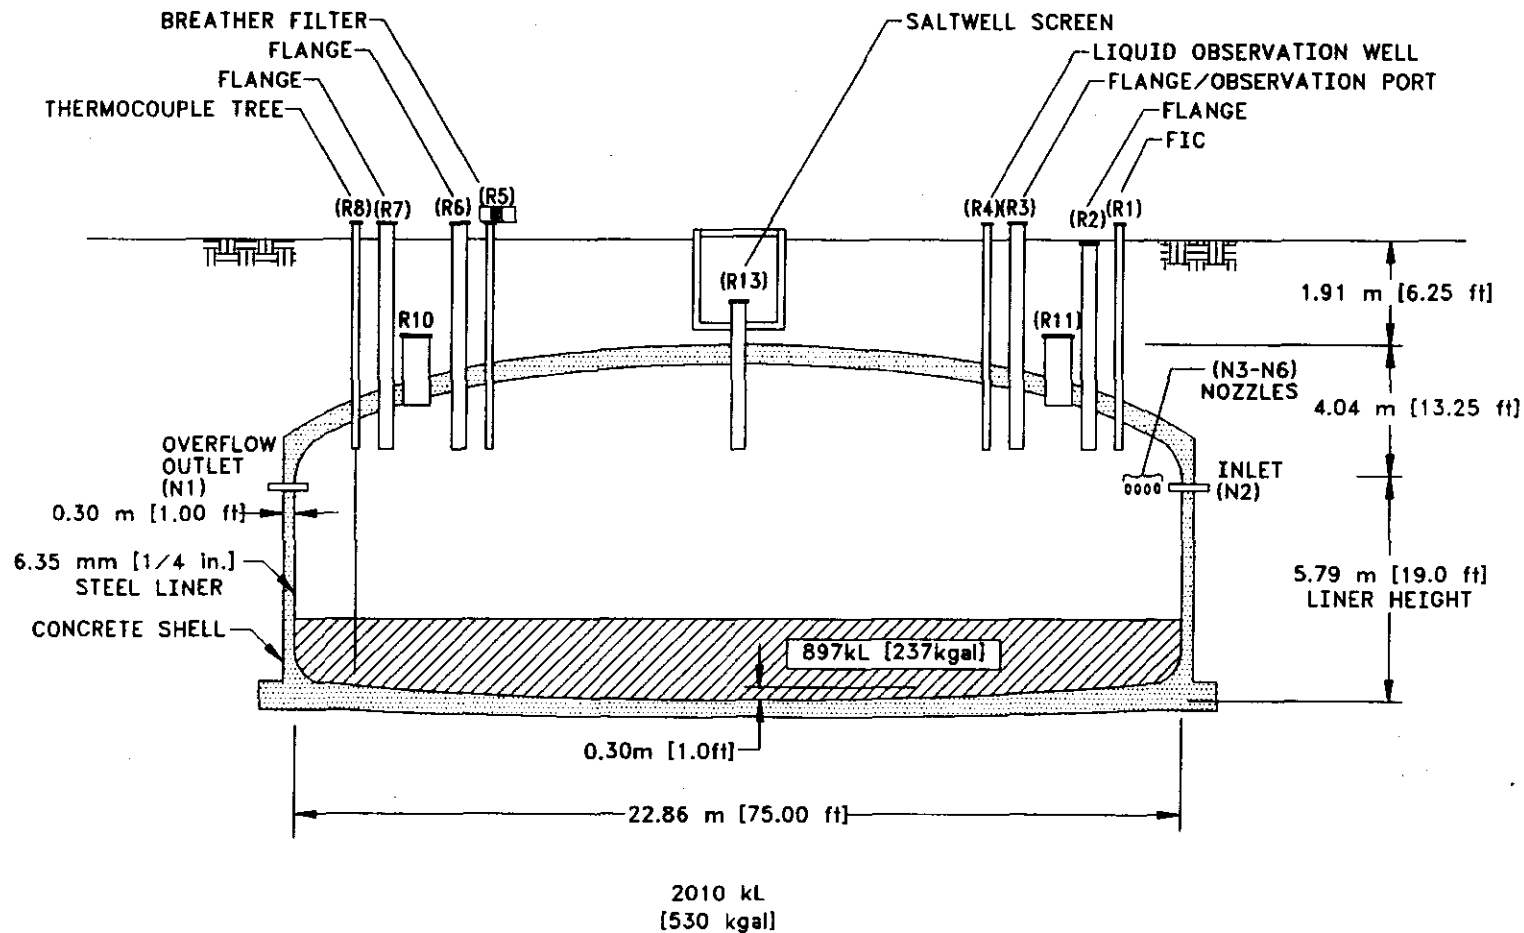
Tank 241-B-111 Cross Section and Schematic.
